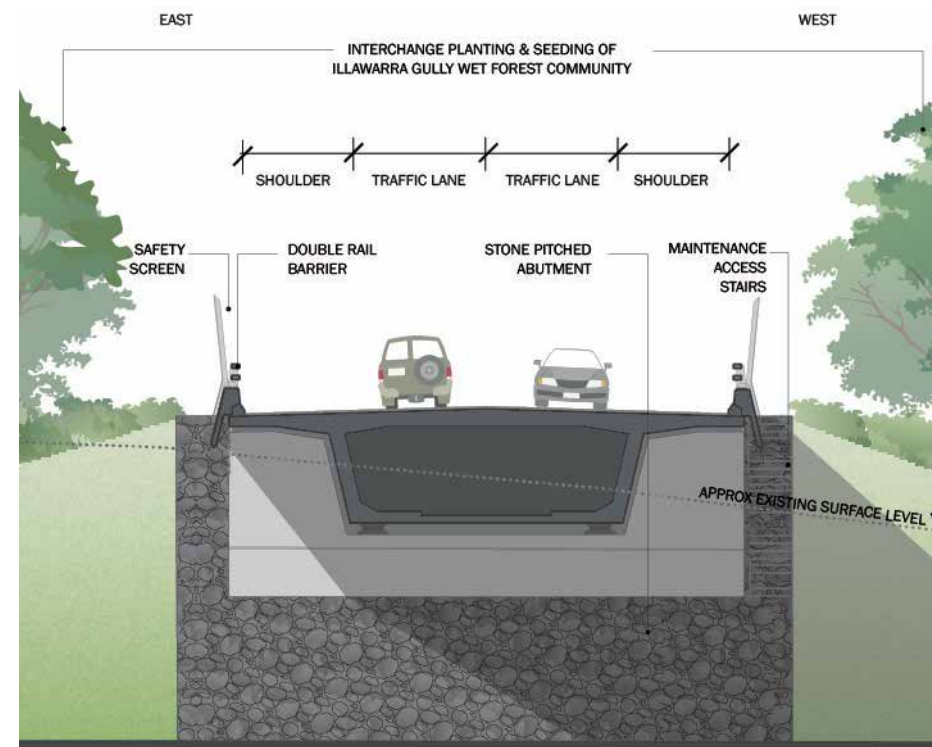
Section – Bridge SB06: Tindalls Lane Overbridge (Scale: 1:200@A3)
